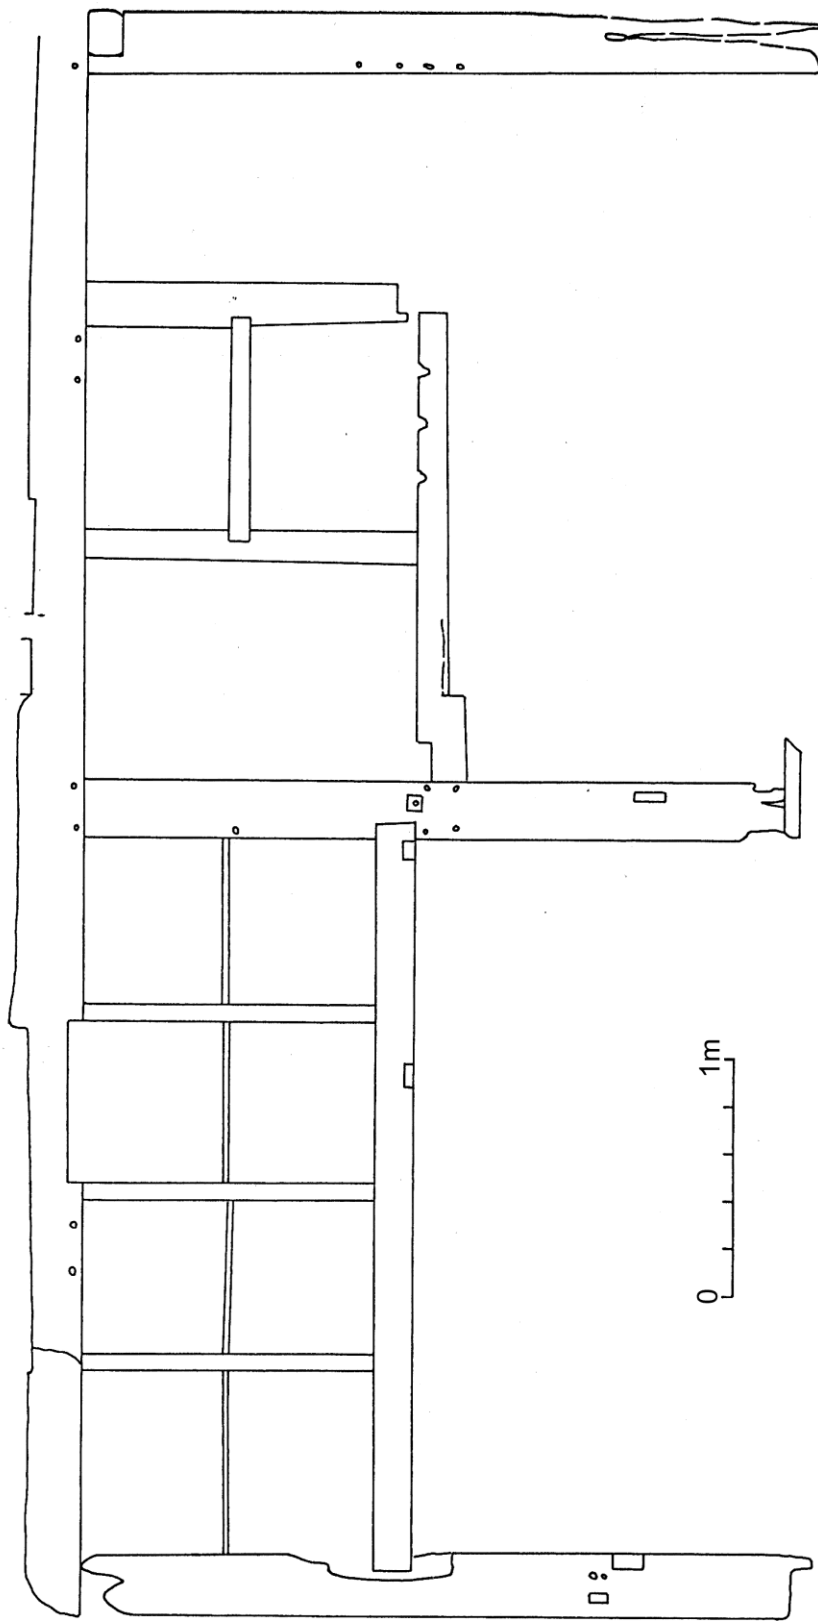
The north wall of the cottages with the timbers of truss 1. Modern windows omitted.
